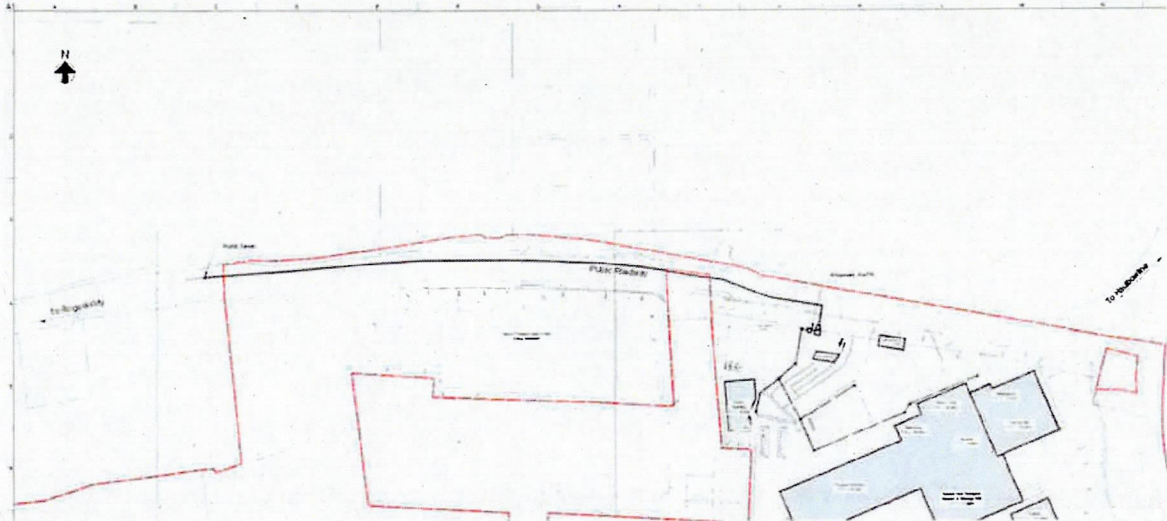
Overall foul drainage layout (excerpt from drawing C000-020)
